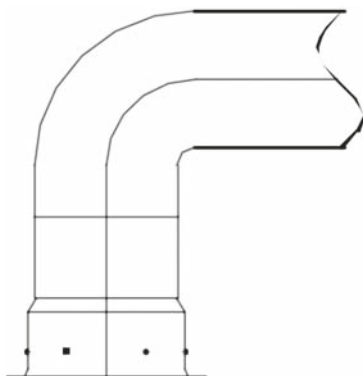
INSTALLATION ON METAL ELBOW WITH CONNECTING SLEEVE
